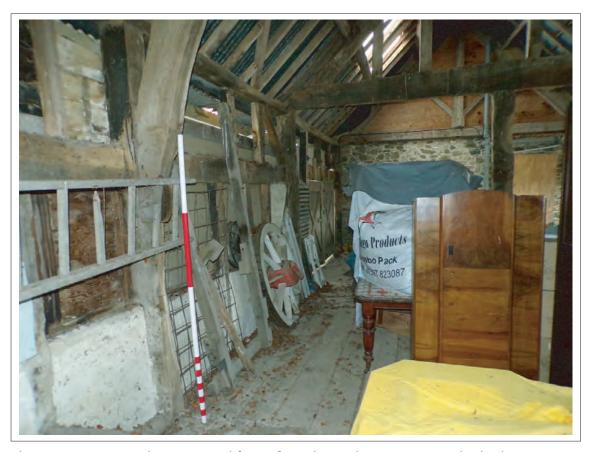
View west along internal face of southern elevation. Note planked area on floor. Scale 1x2m
